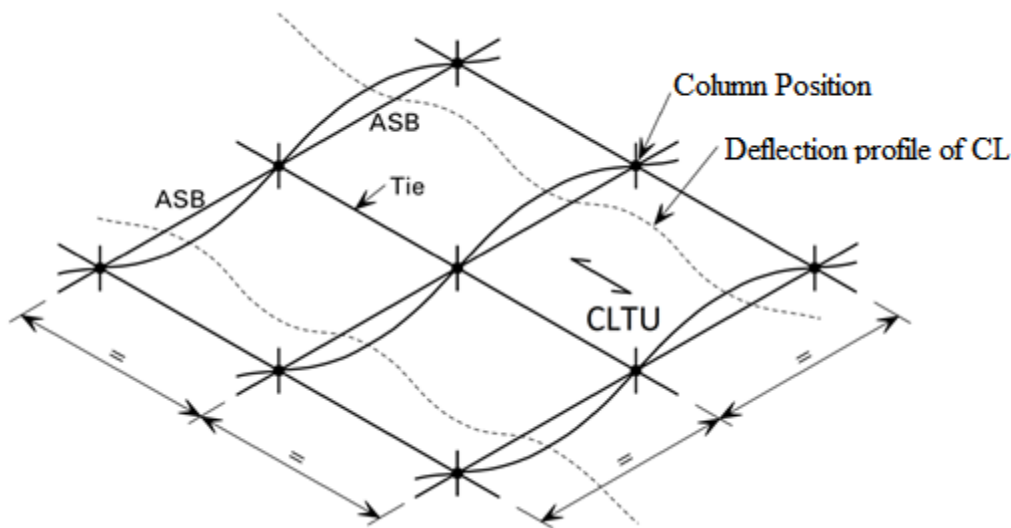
typical fundamental mode shapes for ASB and CLT unit floor system
